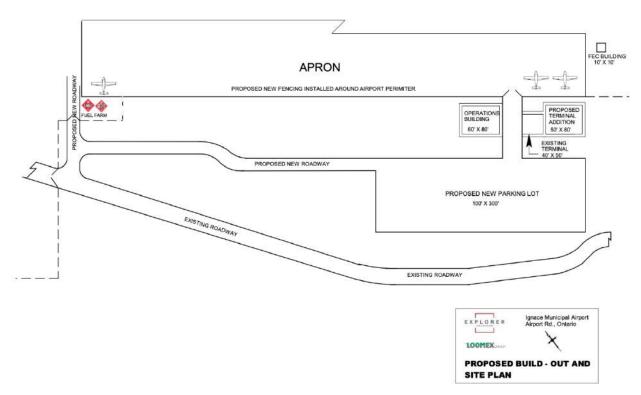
Proposed buildout and site plan, Ignace Municipal Airport.
